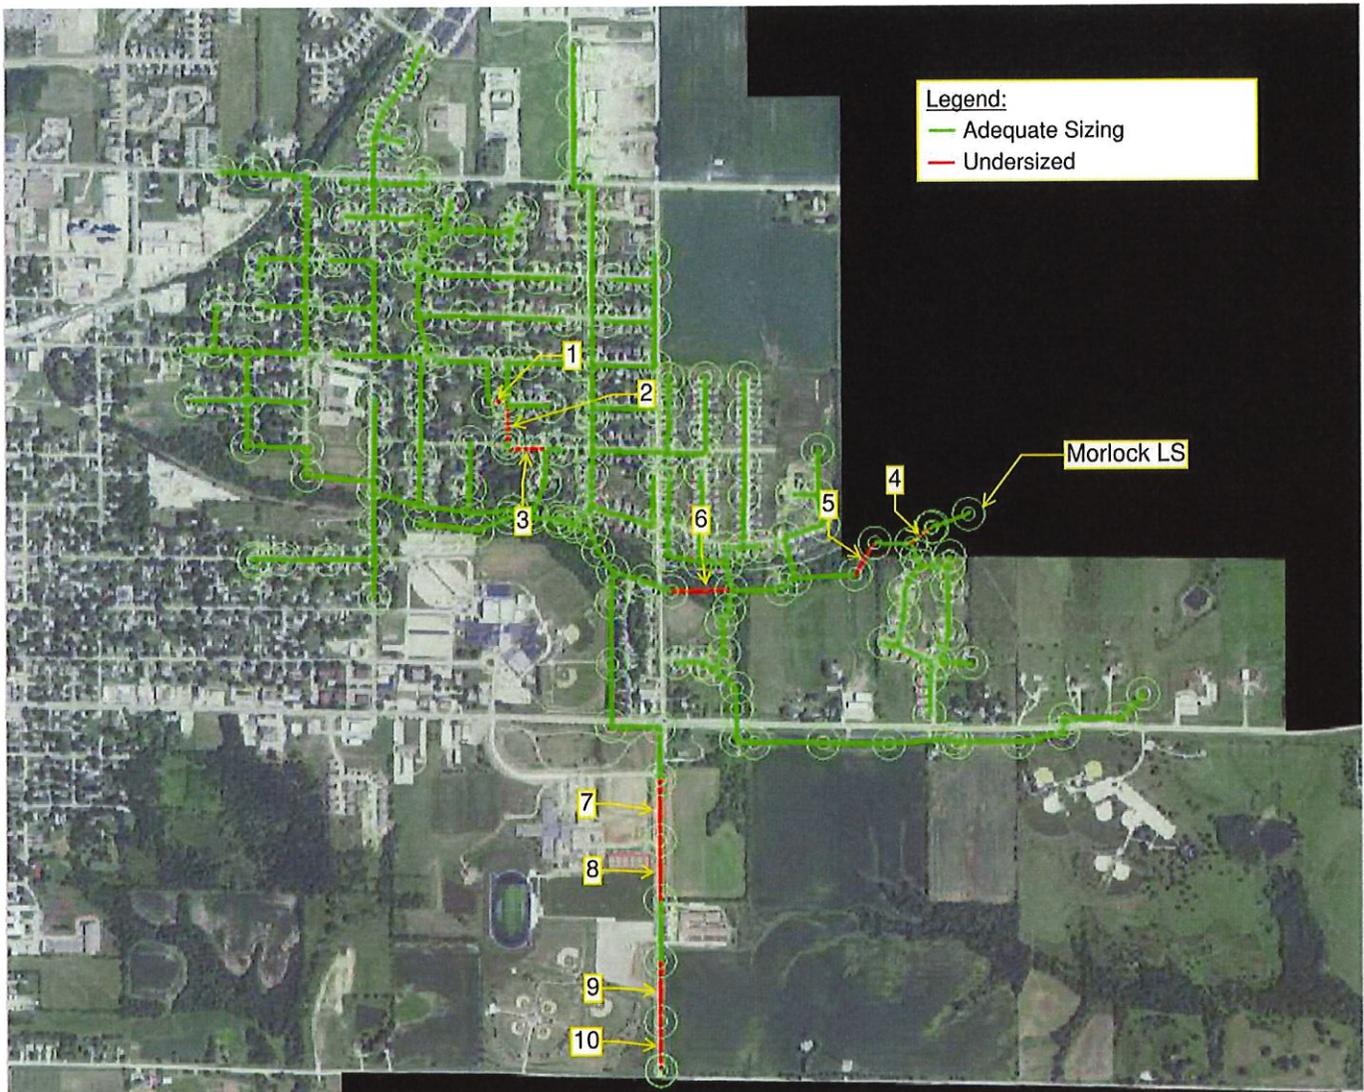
Morlock Lift Station Catchment Area, 25-yr, 24-hr Storm
